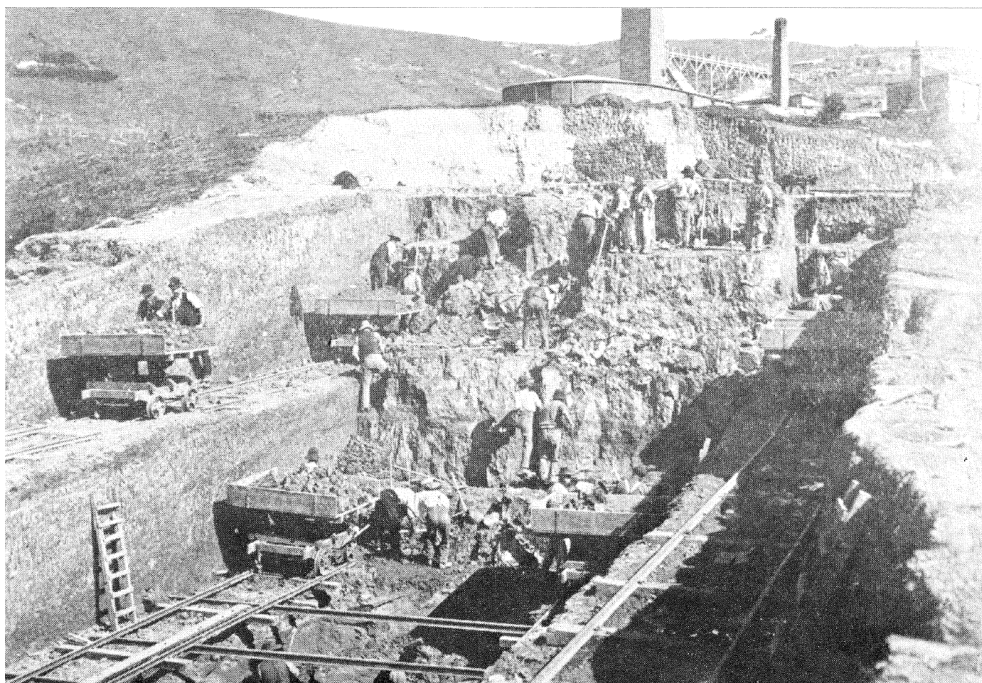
Excavations for the double track tunnel at Rockside in 1907 (Rutherford 1978:41).
